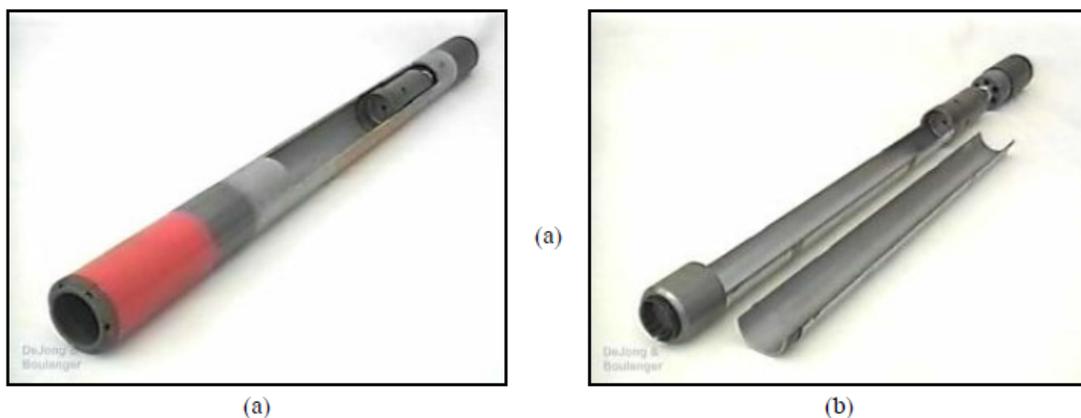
Double Tube Core Barrel. (a) Outer barrel assembly (b) Inner barrel assembly. (After FHWA, 2002)
